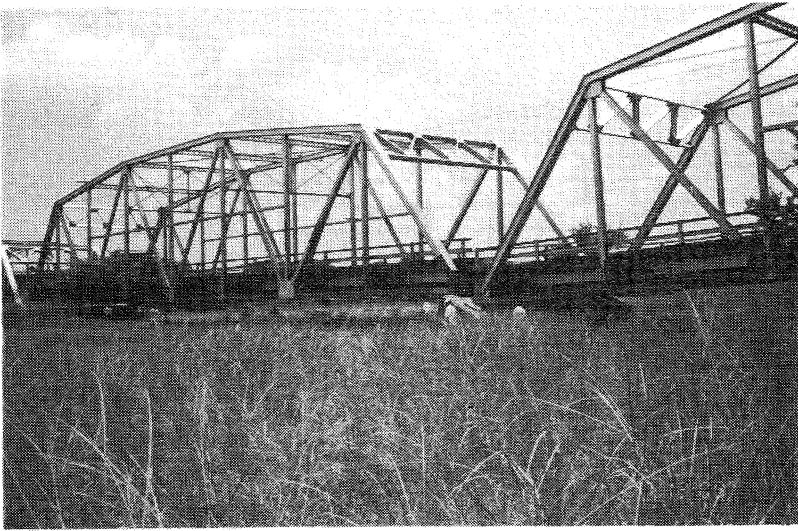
Carmen Bridge; truss span no. 11 viewed towards the southwest
